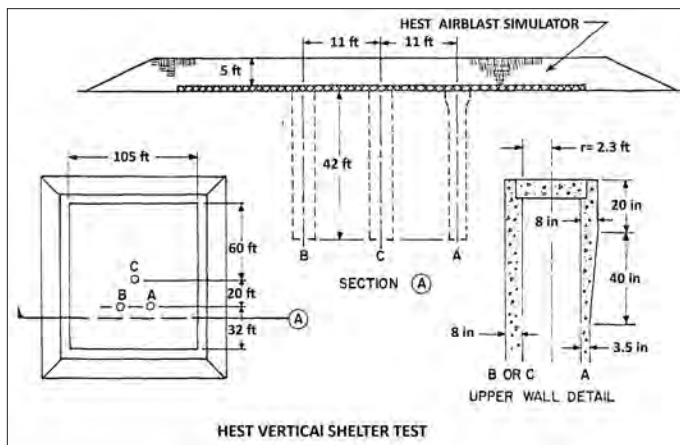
Phase III Vertical Shelter Test (HEST) 1/3 Scale. Three similar models were tested, two designed to respond without significant damage (B and C) and one (A) designed to have major longitudinal compression damage in the launch tube wall. The test was extremely successful and proved not only the value of the mathematical model but also the value of subscale testing.
